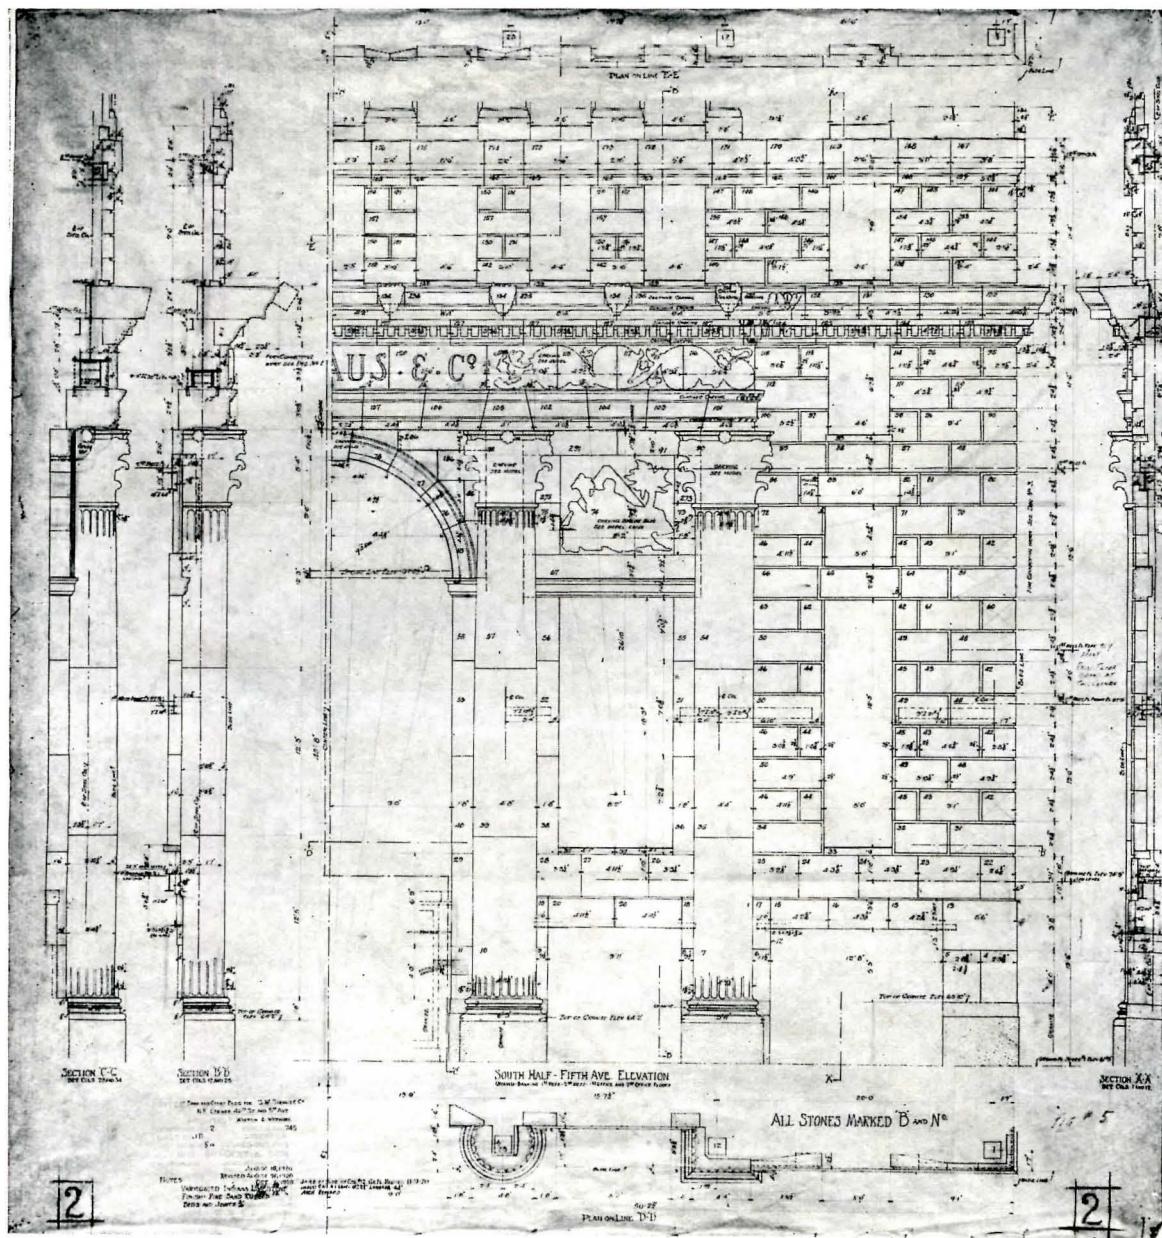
Fifth Avenue Elevation, South Half. Bank and Office Building for S. W. Straus & Co. Warren & Wetmore, Architects.
